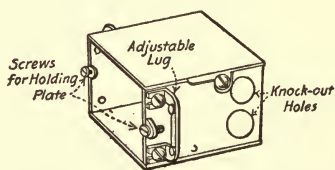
Steel outlet box for a switch or a plug receptacle.
